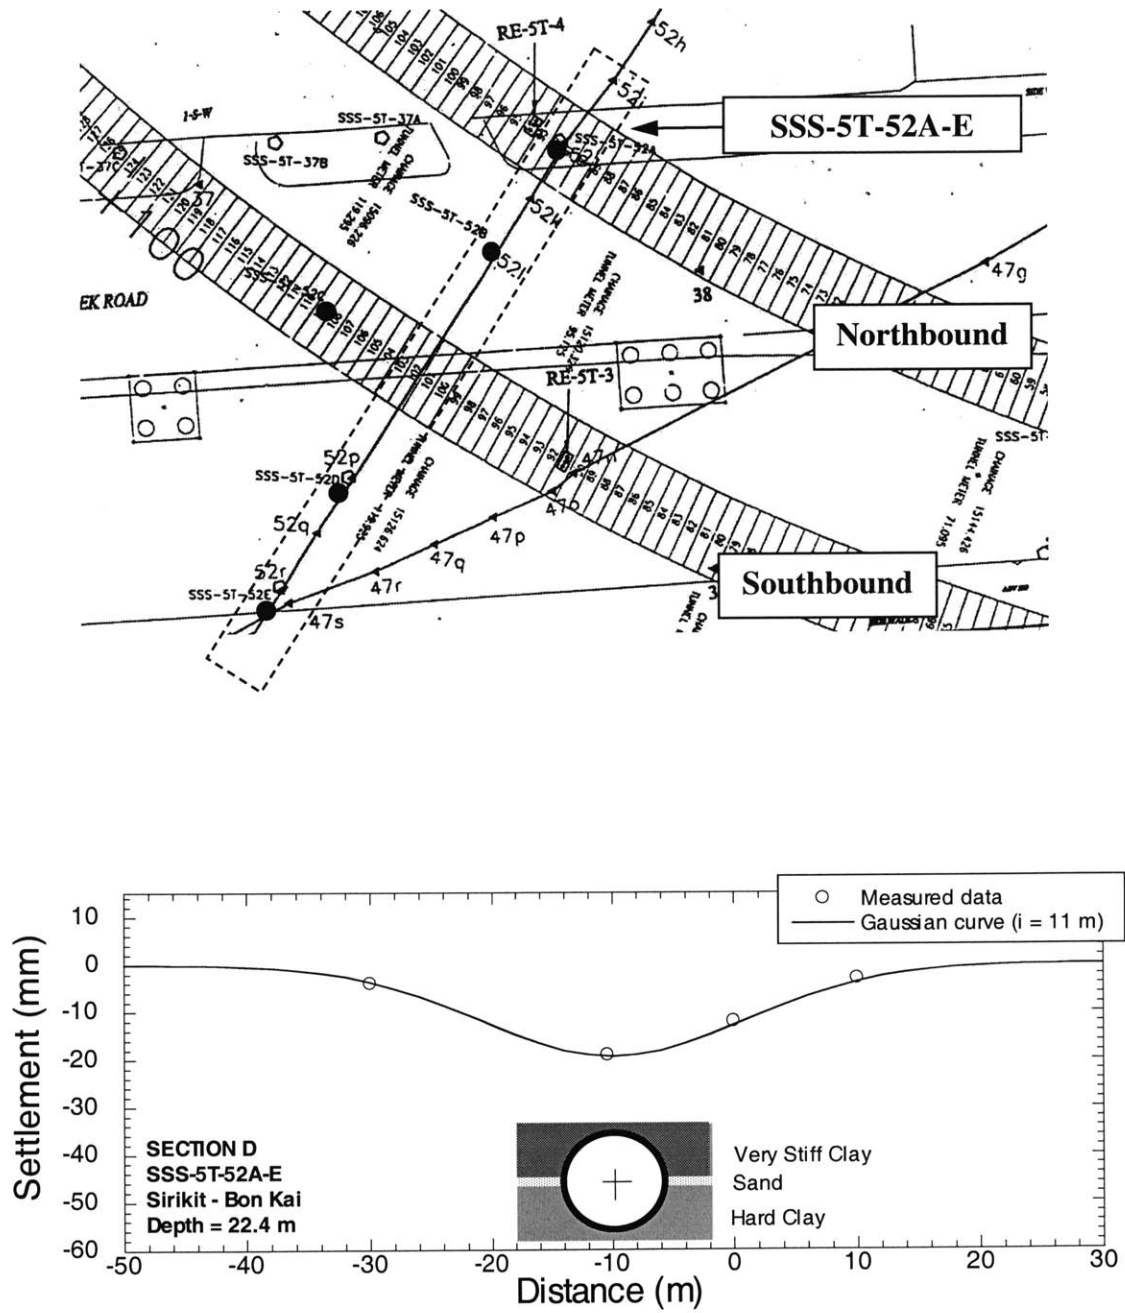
Surface settlement trough measured on SSS-5T-52A-E (southbound tunnel-Ring no.102) and the instrumentation layout
